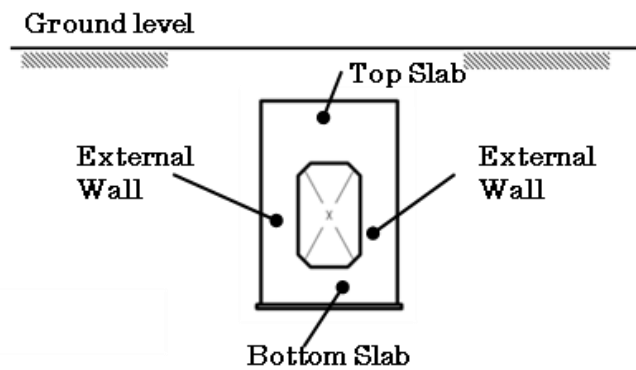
Section, B/B-LOT Connecting Service Tunnel
